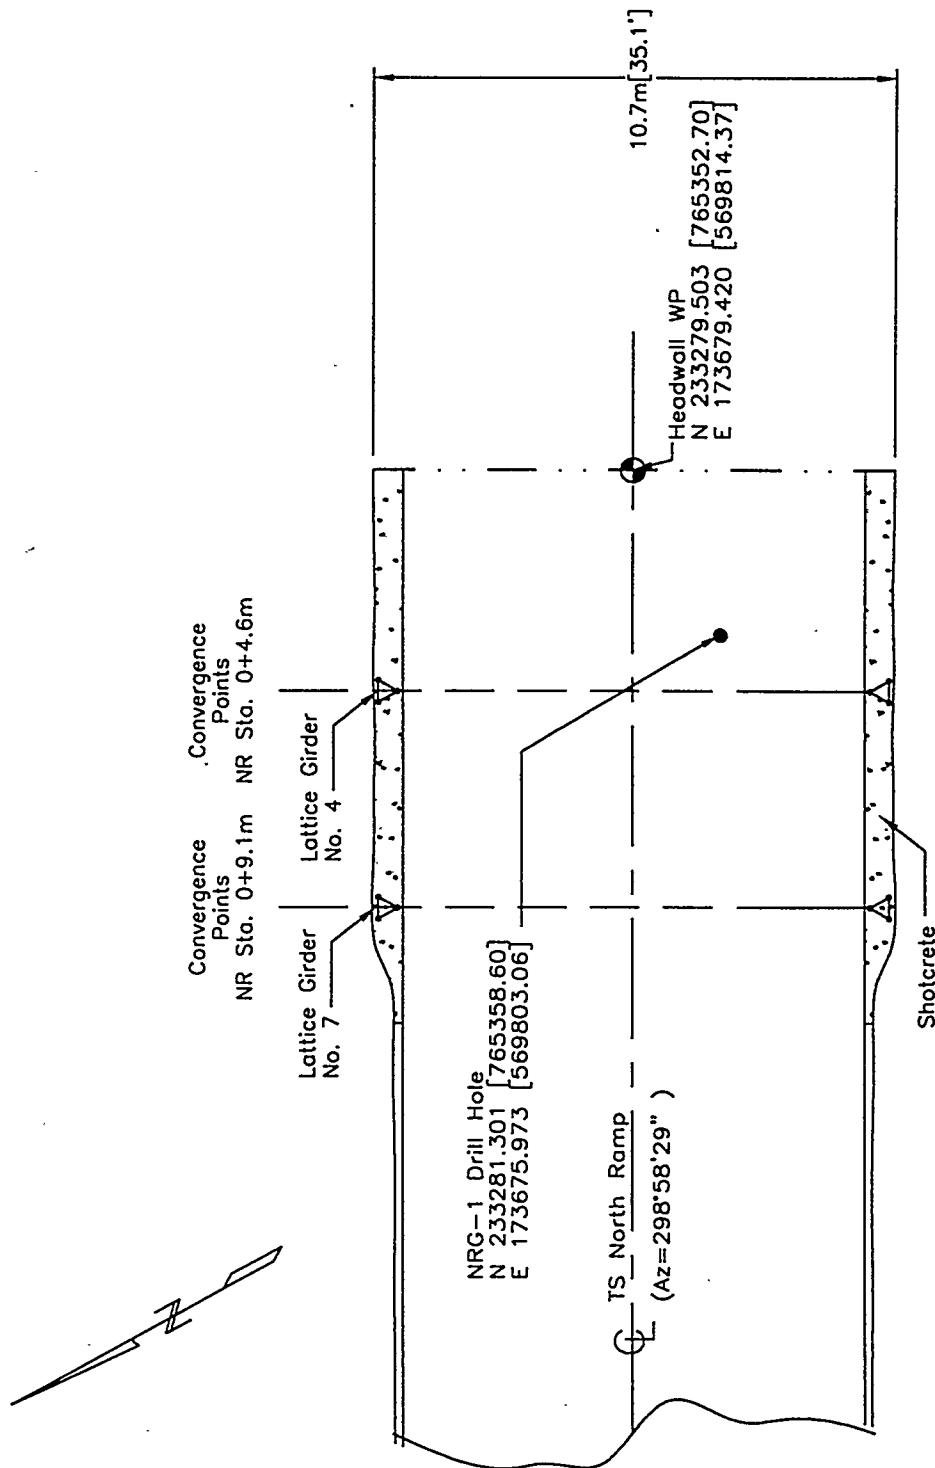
Plan drawing of NRST portal area showing location of lattice girders with convergence point stations 0+4.6 m and 0+9.1 m (from ESF Package 1A, YMP-025-1-MING-MG135, Rev 3).
